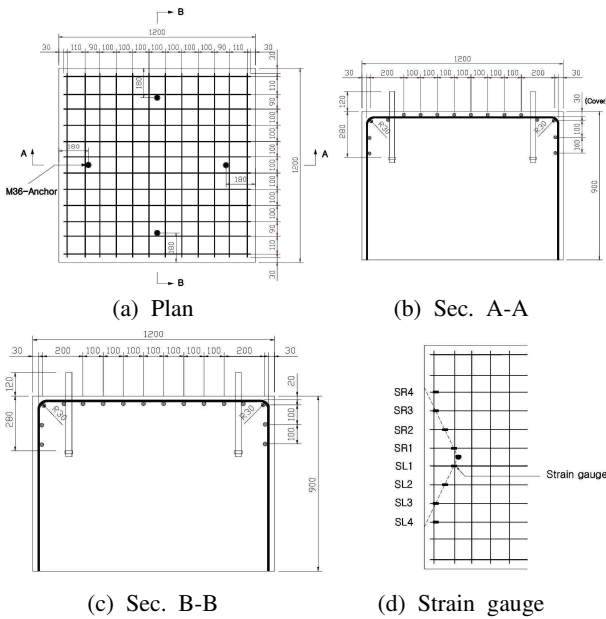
Configuration of test block: M36 anchor, D10 stirrup
